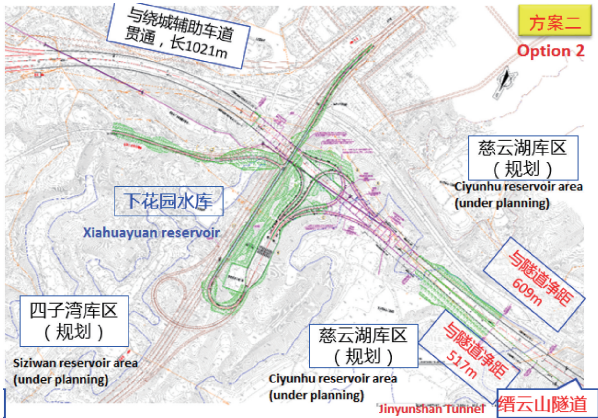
The floor plan of the K-line Zouma Interchange (Option 2)
